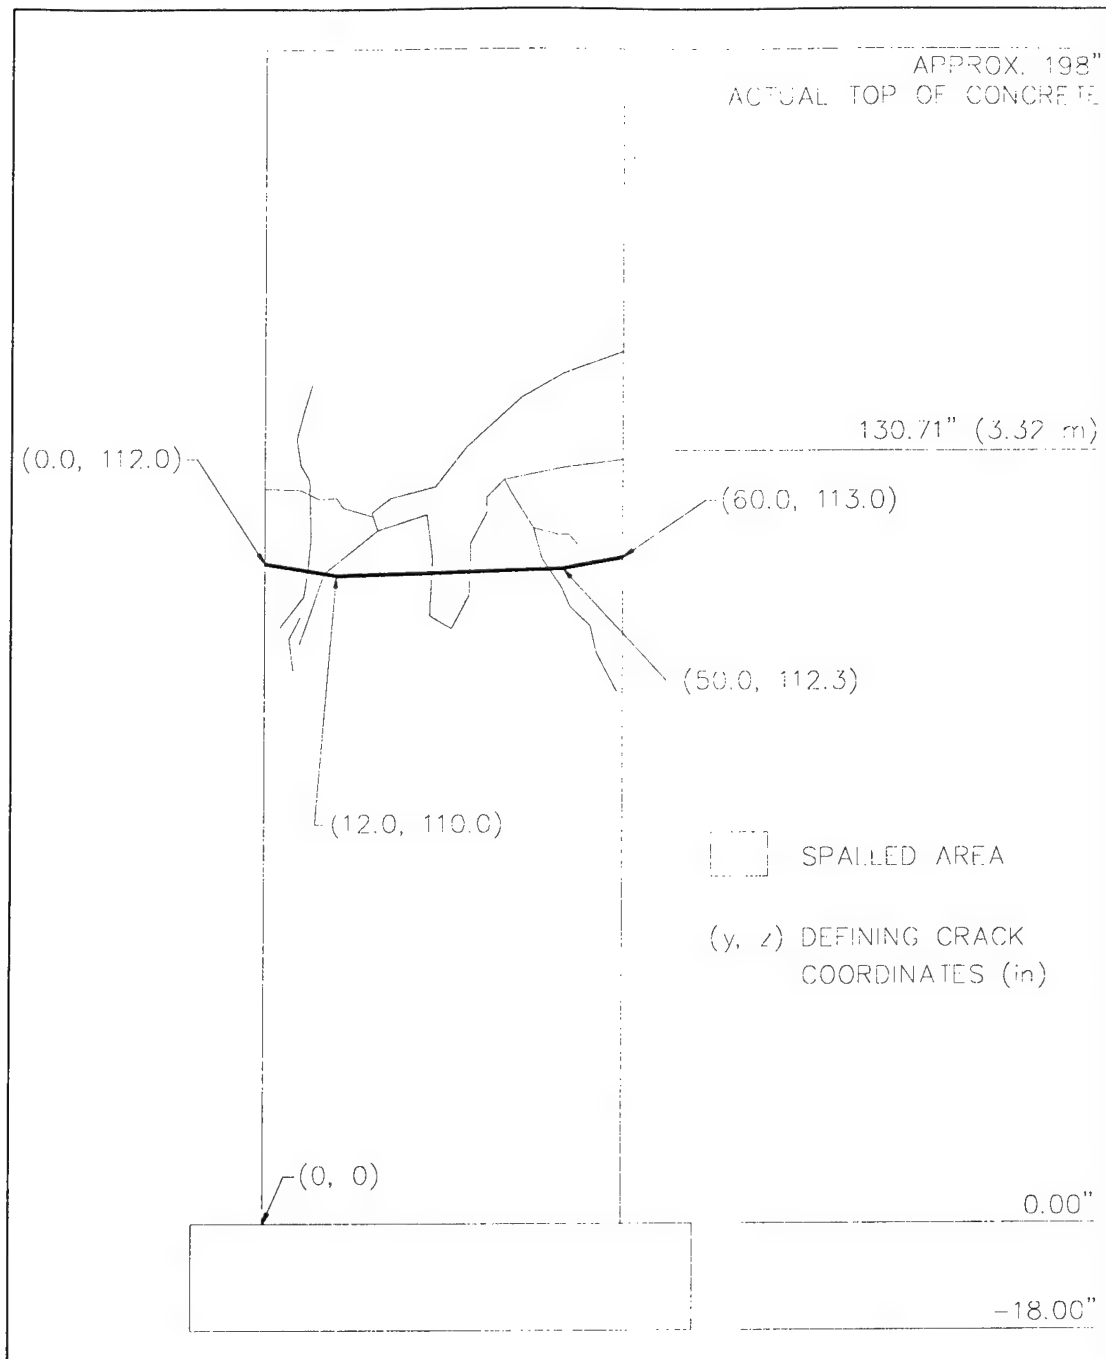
Drawing of the upstream face showing cracks, spalling, and primary crack coordinates.
